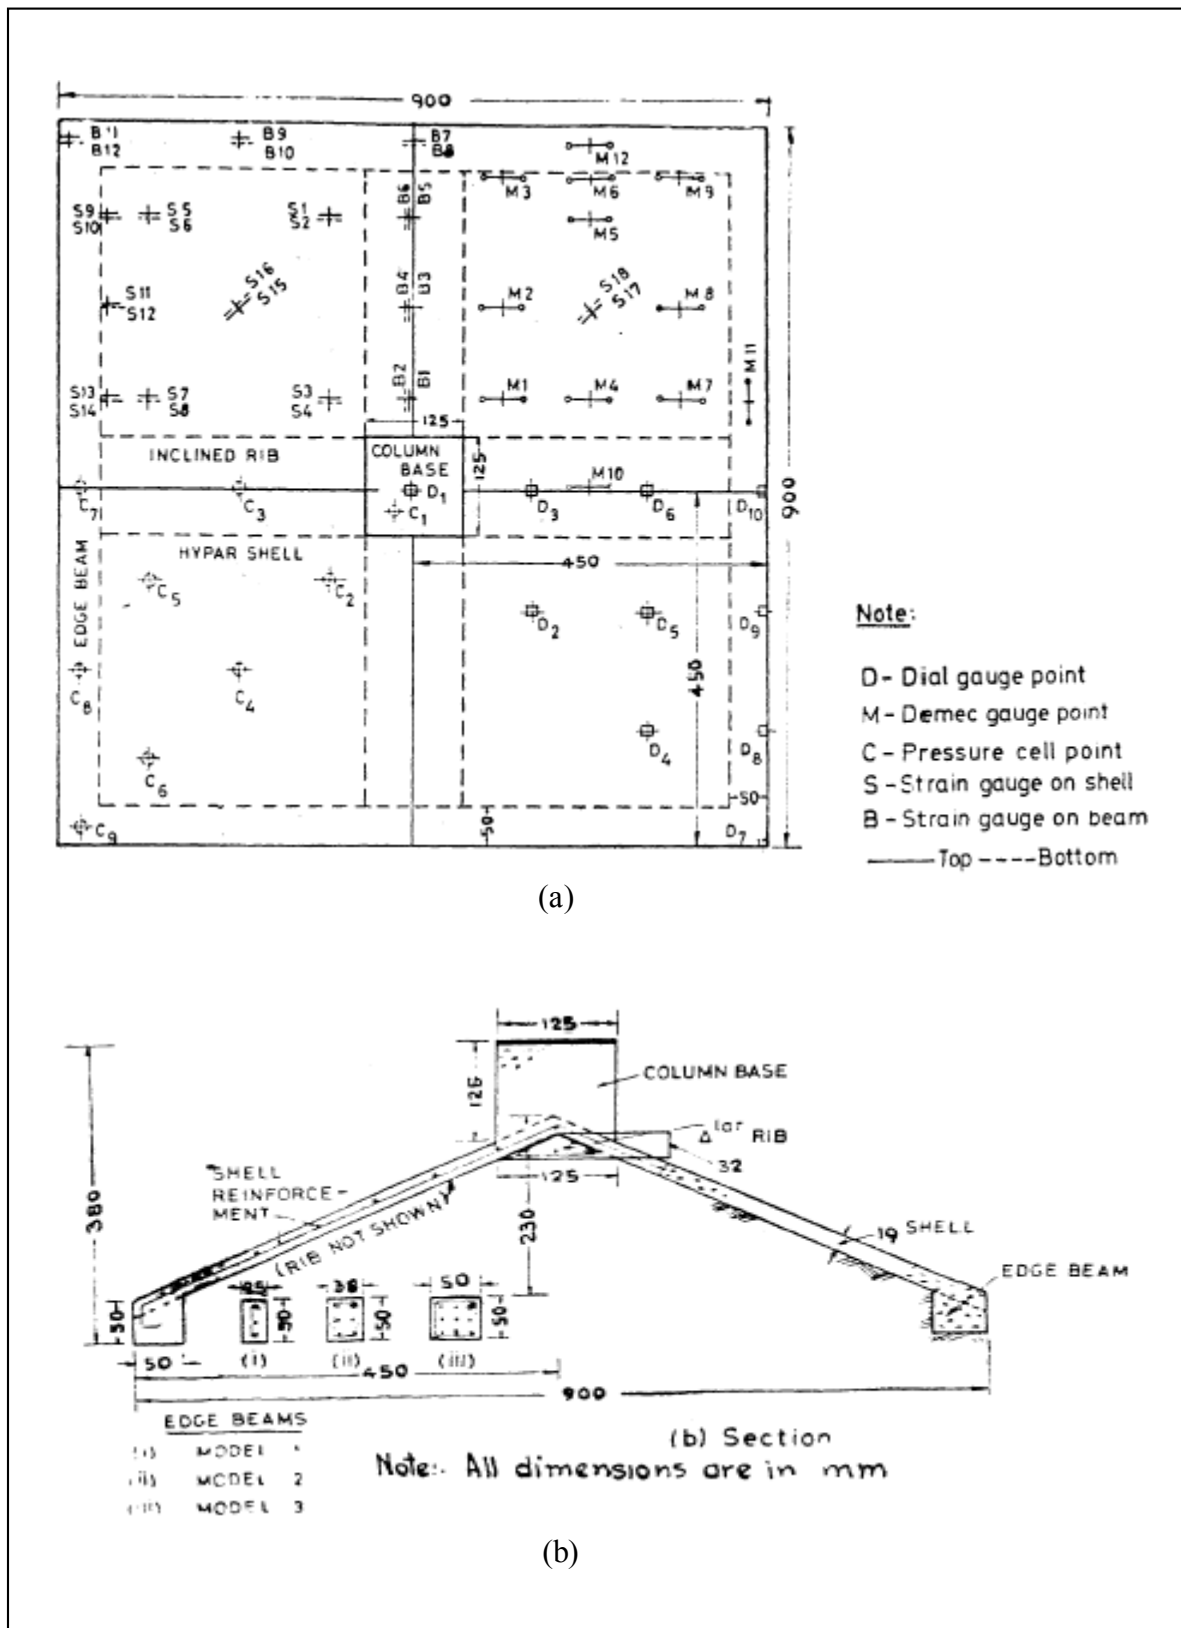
Hypar Shell Footing Model: (a) Plan view showing instrumentation (b) Cross-sectional view (Varghese and Kurian, 1971).
